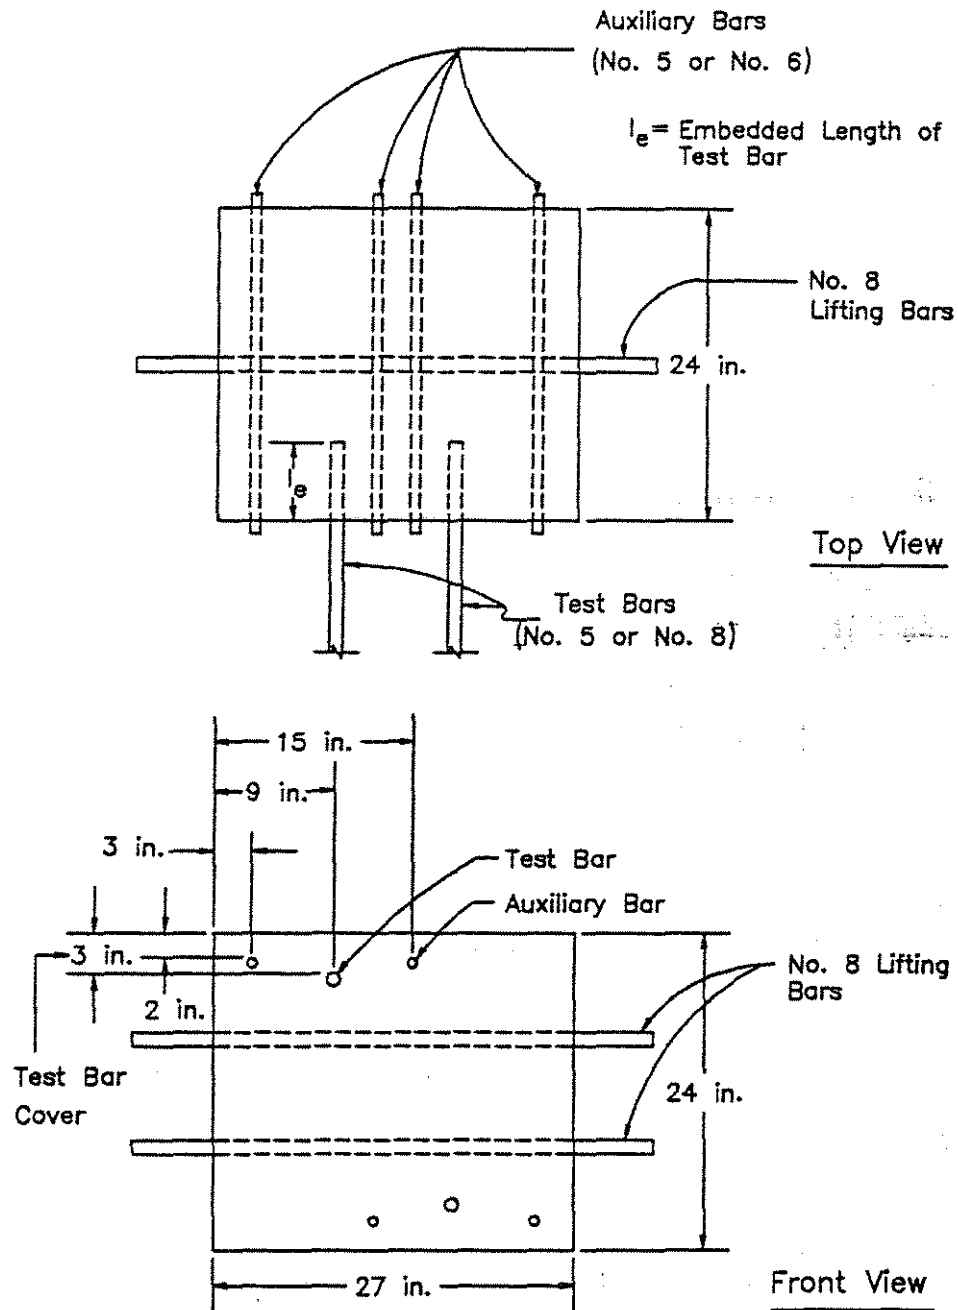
Test Specimen with Horizontal Bars as Cast
